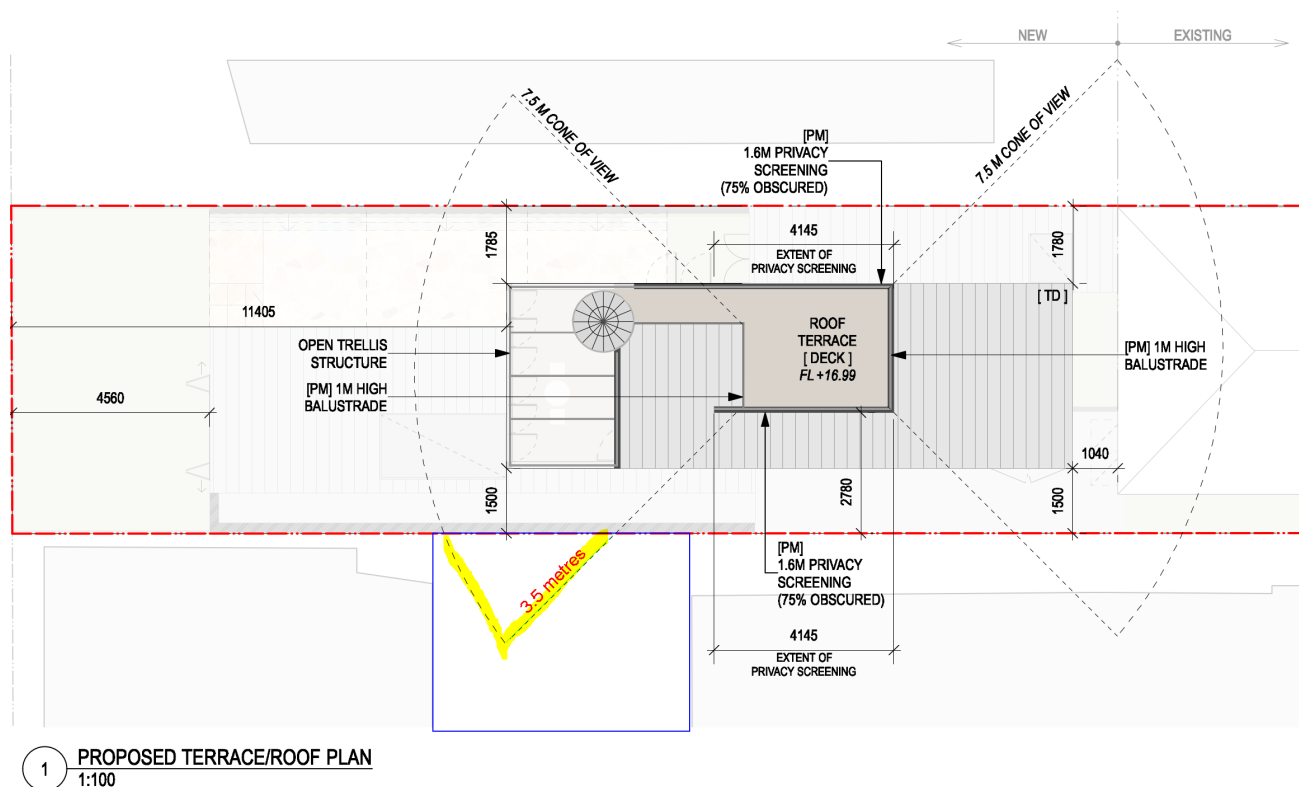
Cone-of-vision from proposed Roof Terrace of subject site – showing a portion of the primary outdoor living area within the cone-of-vision of the southern adjoining property (31 Swanbourne Street).
